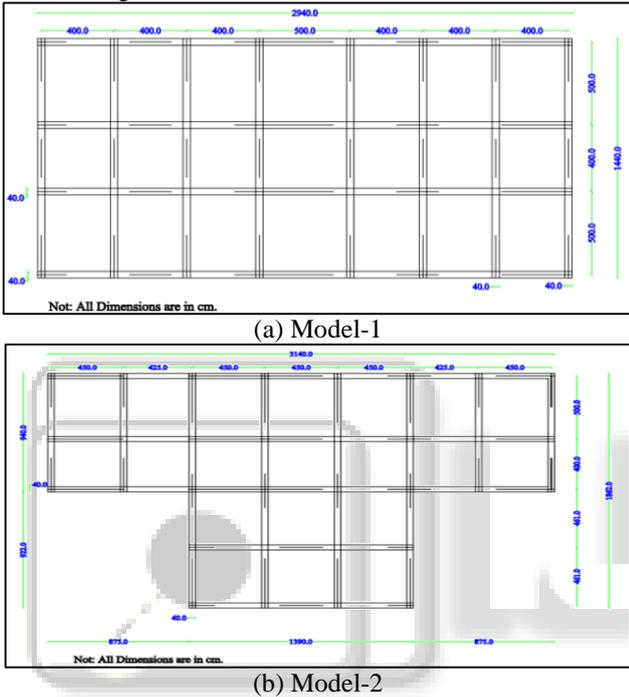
Plans of Selected Reinforced Concrete Framed Buildings
